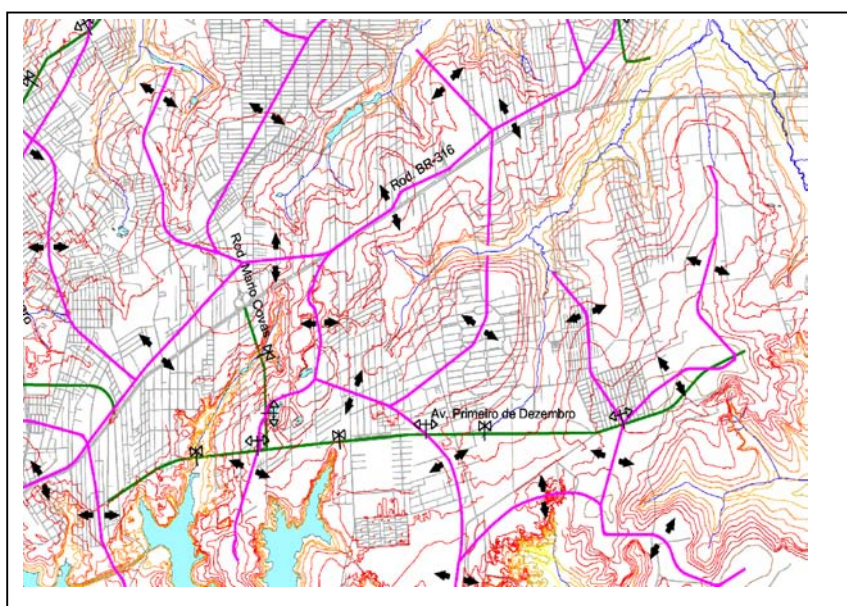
Proposed Drainage Plan for Av. Primeiro de Dezembro
